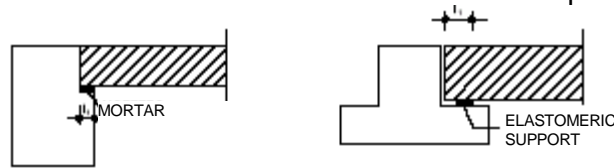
a Direct supports in hollow-core slabs
